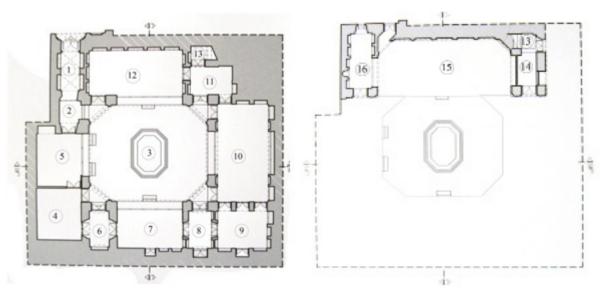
First Floor Plan of Akhavizadegan Khaneh-Hussainia (Mohamadzadeh et al. 2007)
